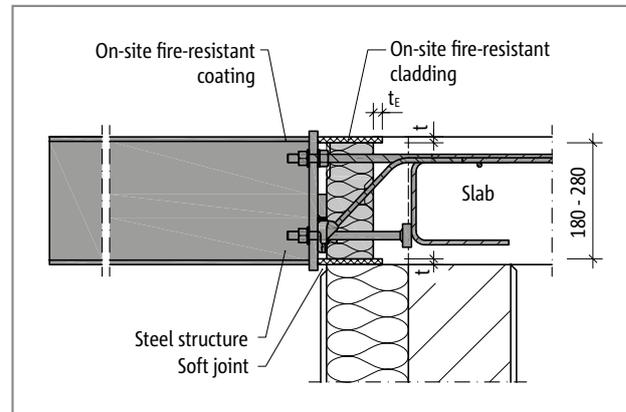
Schöck Isokorb® T type SK: on site fire-resistant cladding of the connection when using steel structures with fire-resistant coating; cross-section
